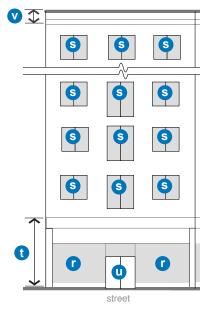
(2). Storefront Building: Height & Use Requirements.
